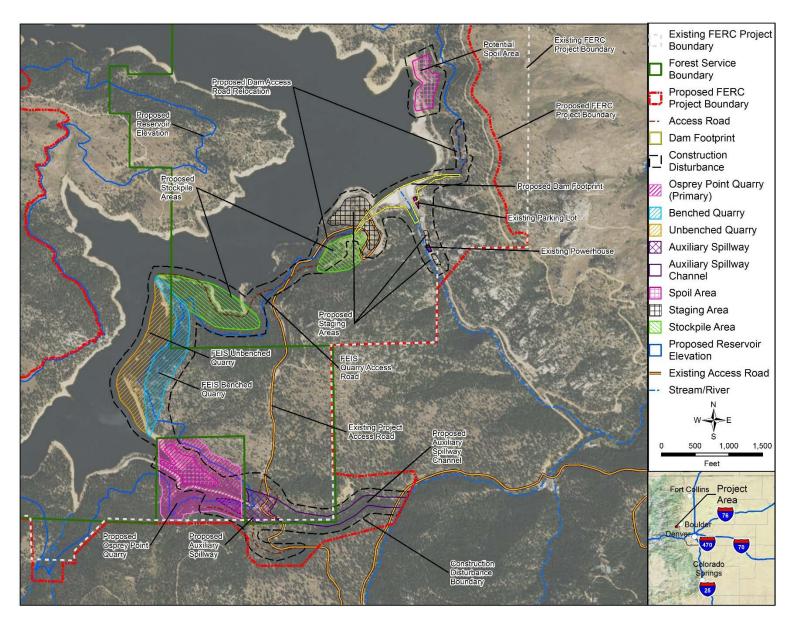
Location of proposed construction activities (Source: Denver Water, 2016, as modified by staff
